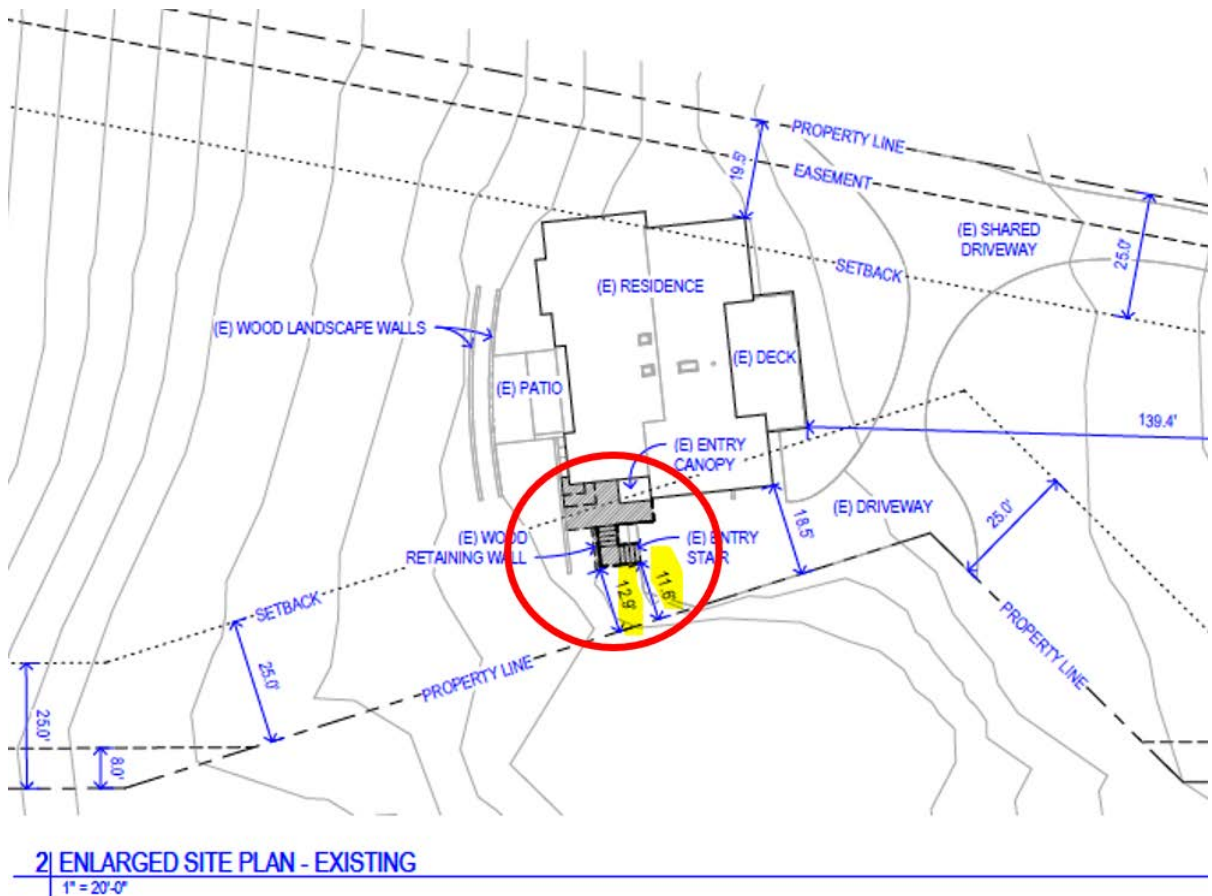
Site plans depicting the existing retaining wall and entry stairs that currently encroach into the side-yard setback (circled in red) that are proposed to be demoed and replaced.
